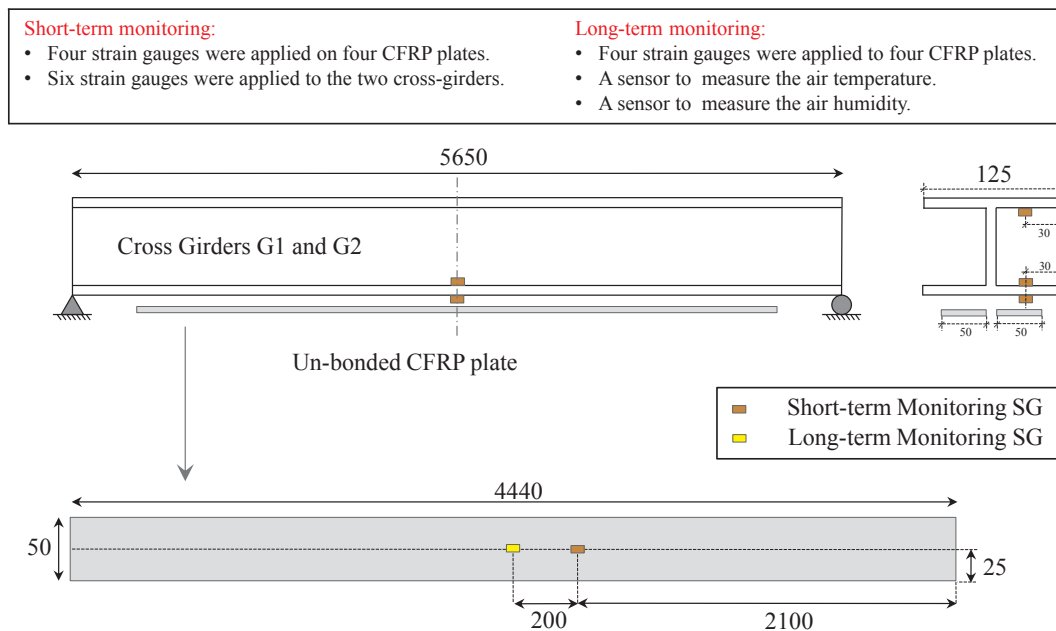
Layouts of sensor placements for the short- and long-term monitoring schemes on the steel cross-girders of the Diamond Creek Bridge and the un-bonded prestressed CFRP plates.
